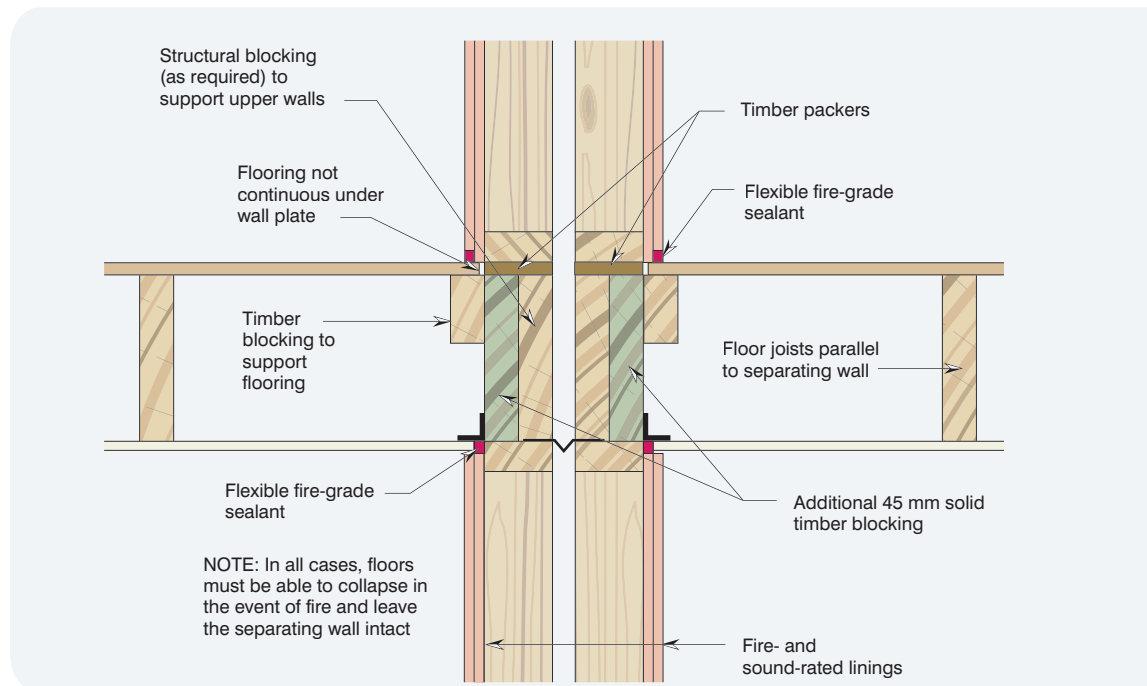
Joist parallel to wall, wall stud not continuous through junction – FRL 60 minutes – elevation view.
